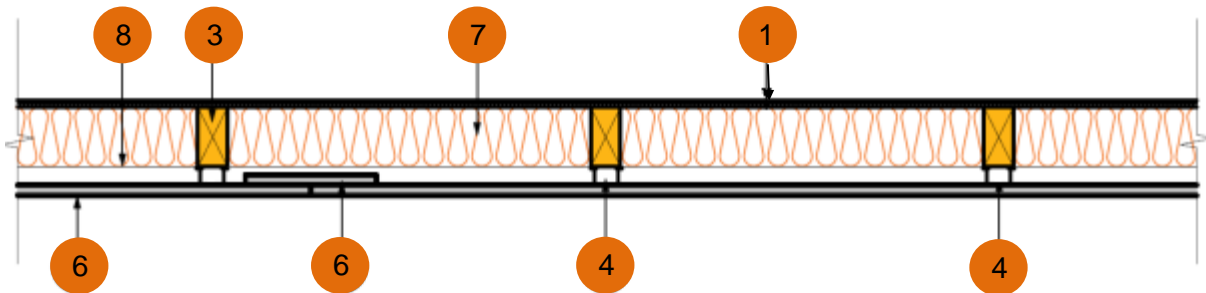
Horizontal INEX>RENDERBOARD Wall System Timber Frame – Plan Section
